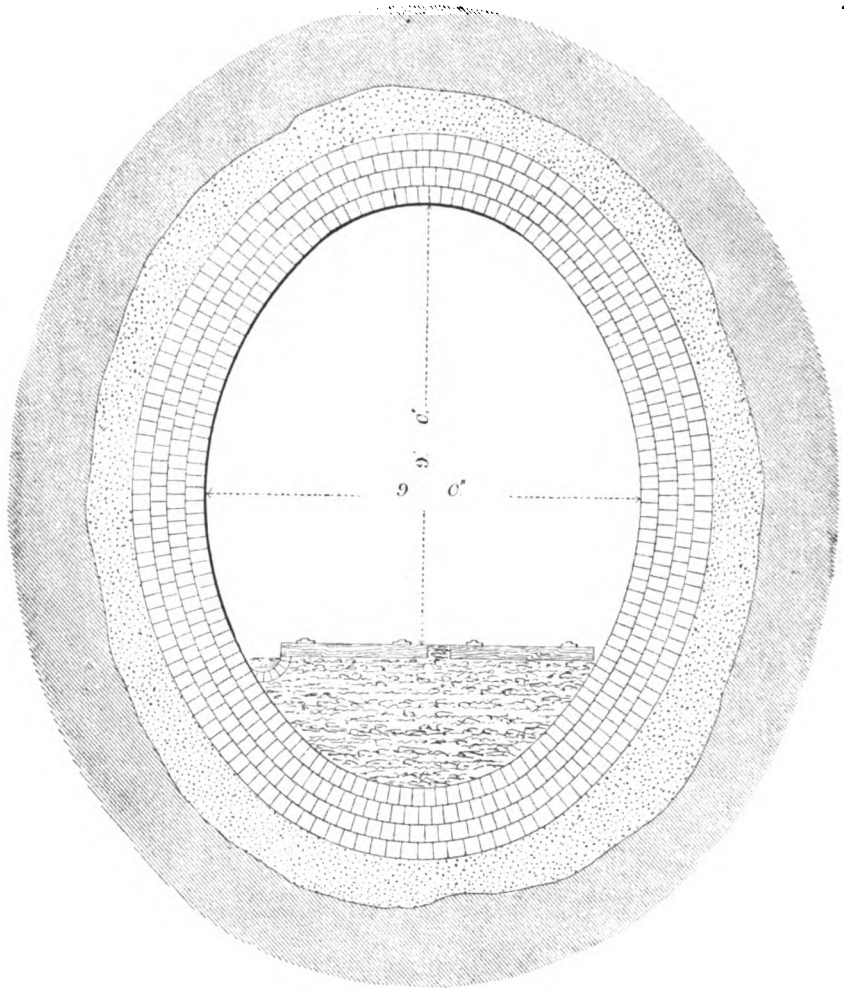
SECTION OF ELLIPTICALLY ARCHED ROADWAY, HAVING ONE FOOT OF SAND INTERPOSED BETWEEN THE ARCHING AND STRATIFICATION, AND SHOWING A DOUBLE LINE OF RAILS LAID, AND GUTTER FORMED IN IT.
